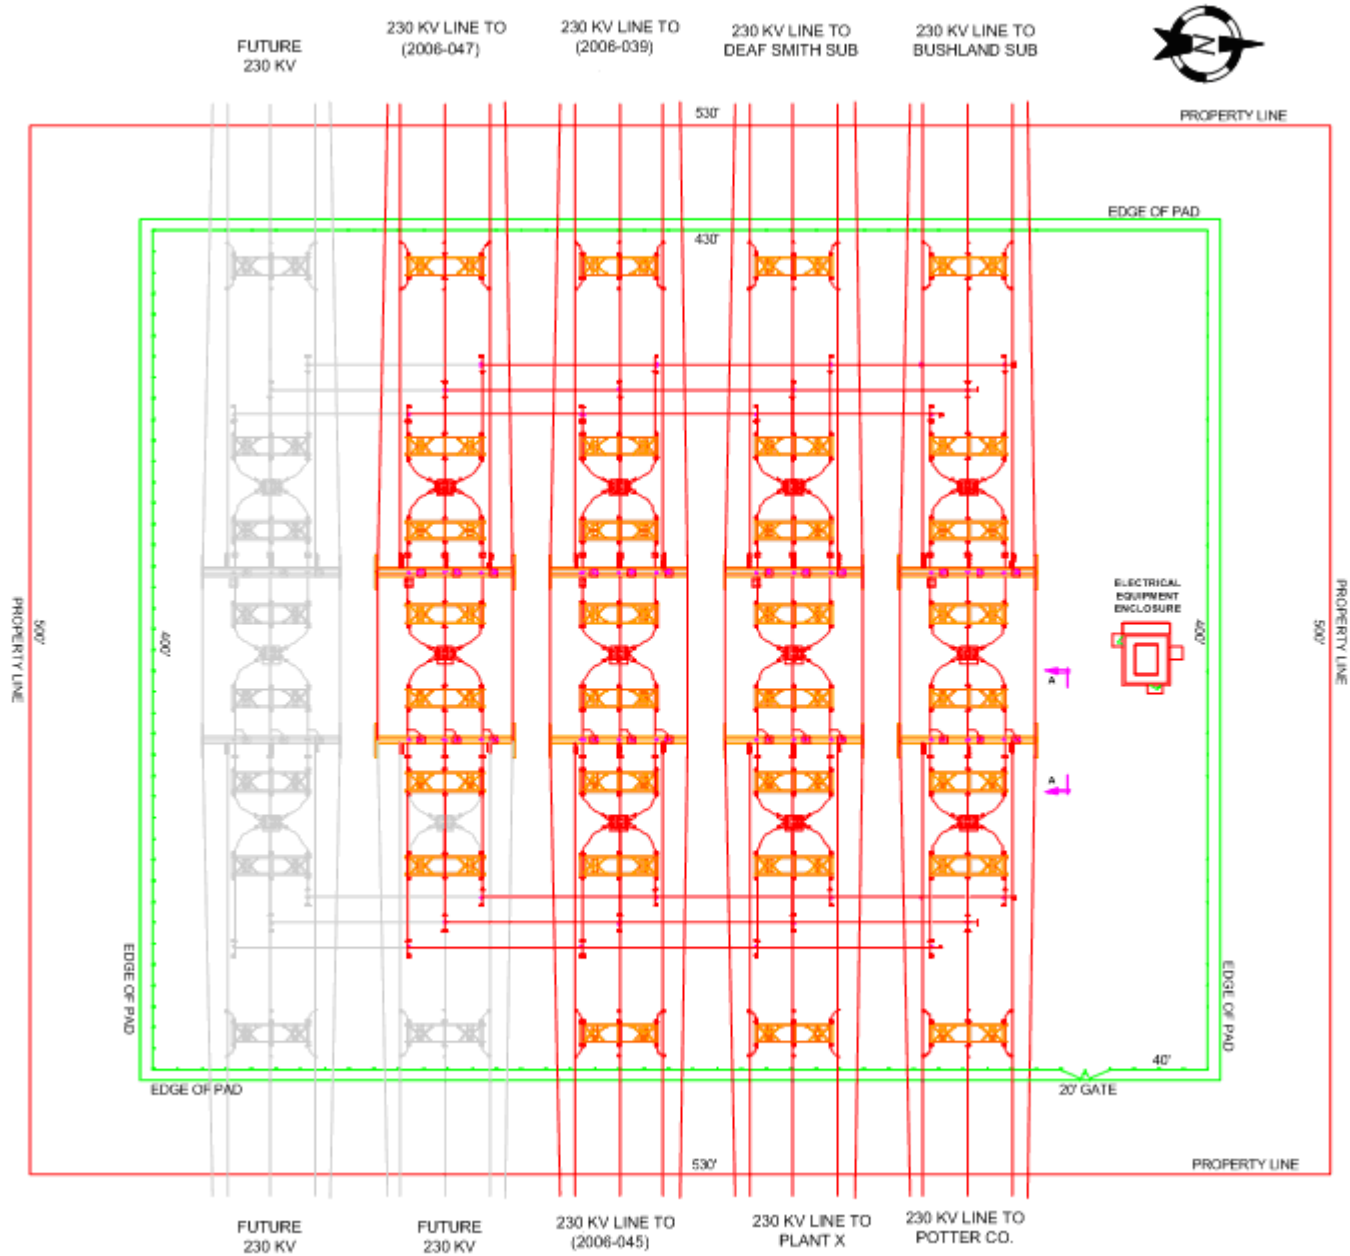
New SPS Switching Station Interconnection Facility Plan View
